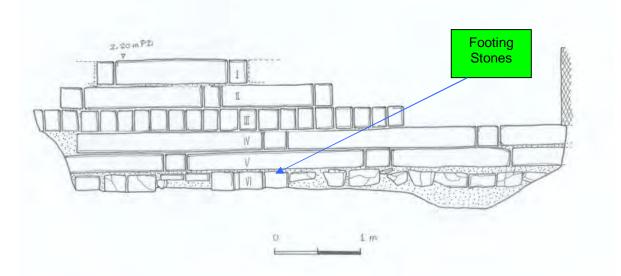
Eastern Side Wall and Footing Stones of Longjin Bridge in T3b
